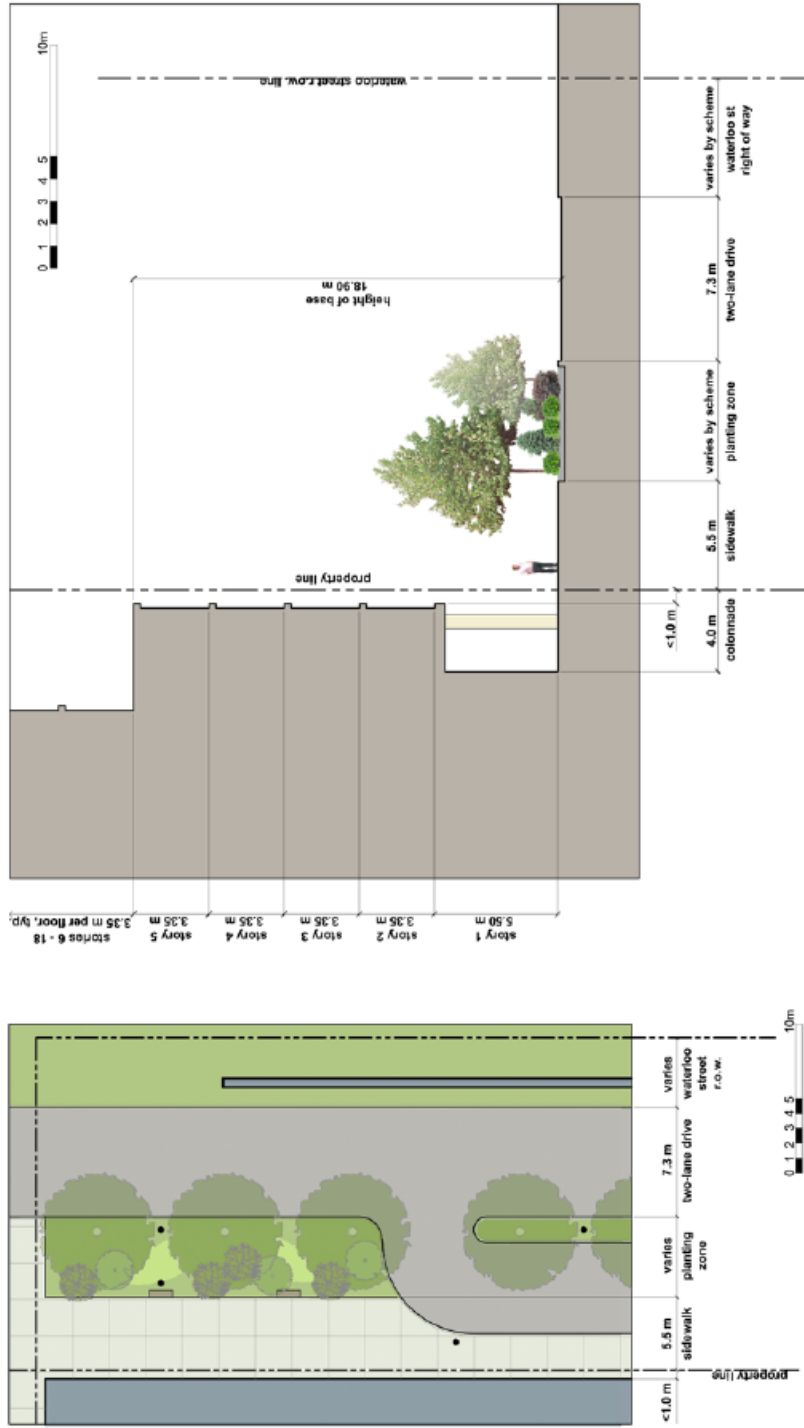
04 Waterloo Street Right of Way Streetscape Plan and Section
